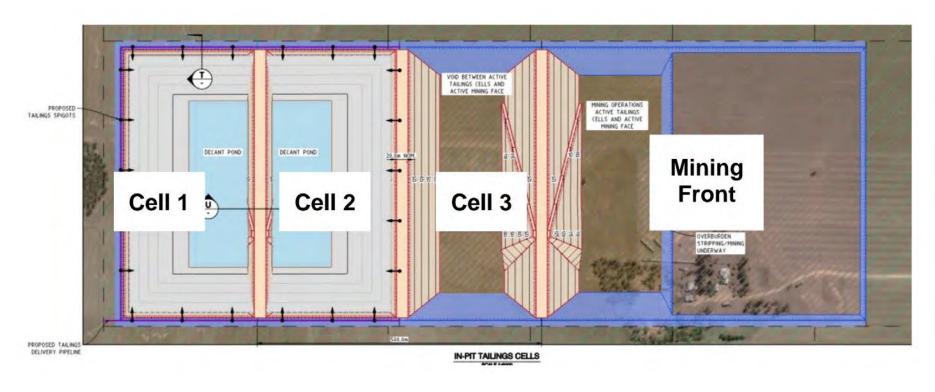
In-Pit Tailings Disposal Indicative Arrangement
